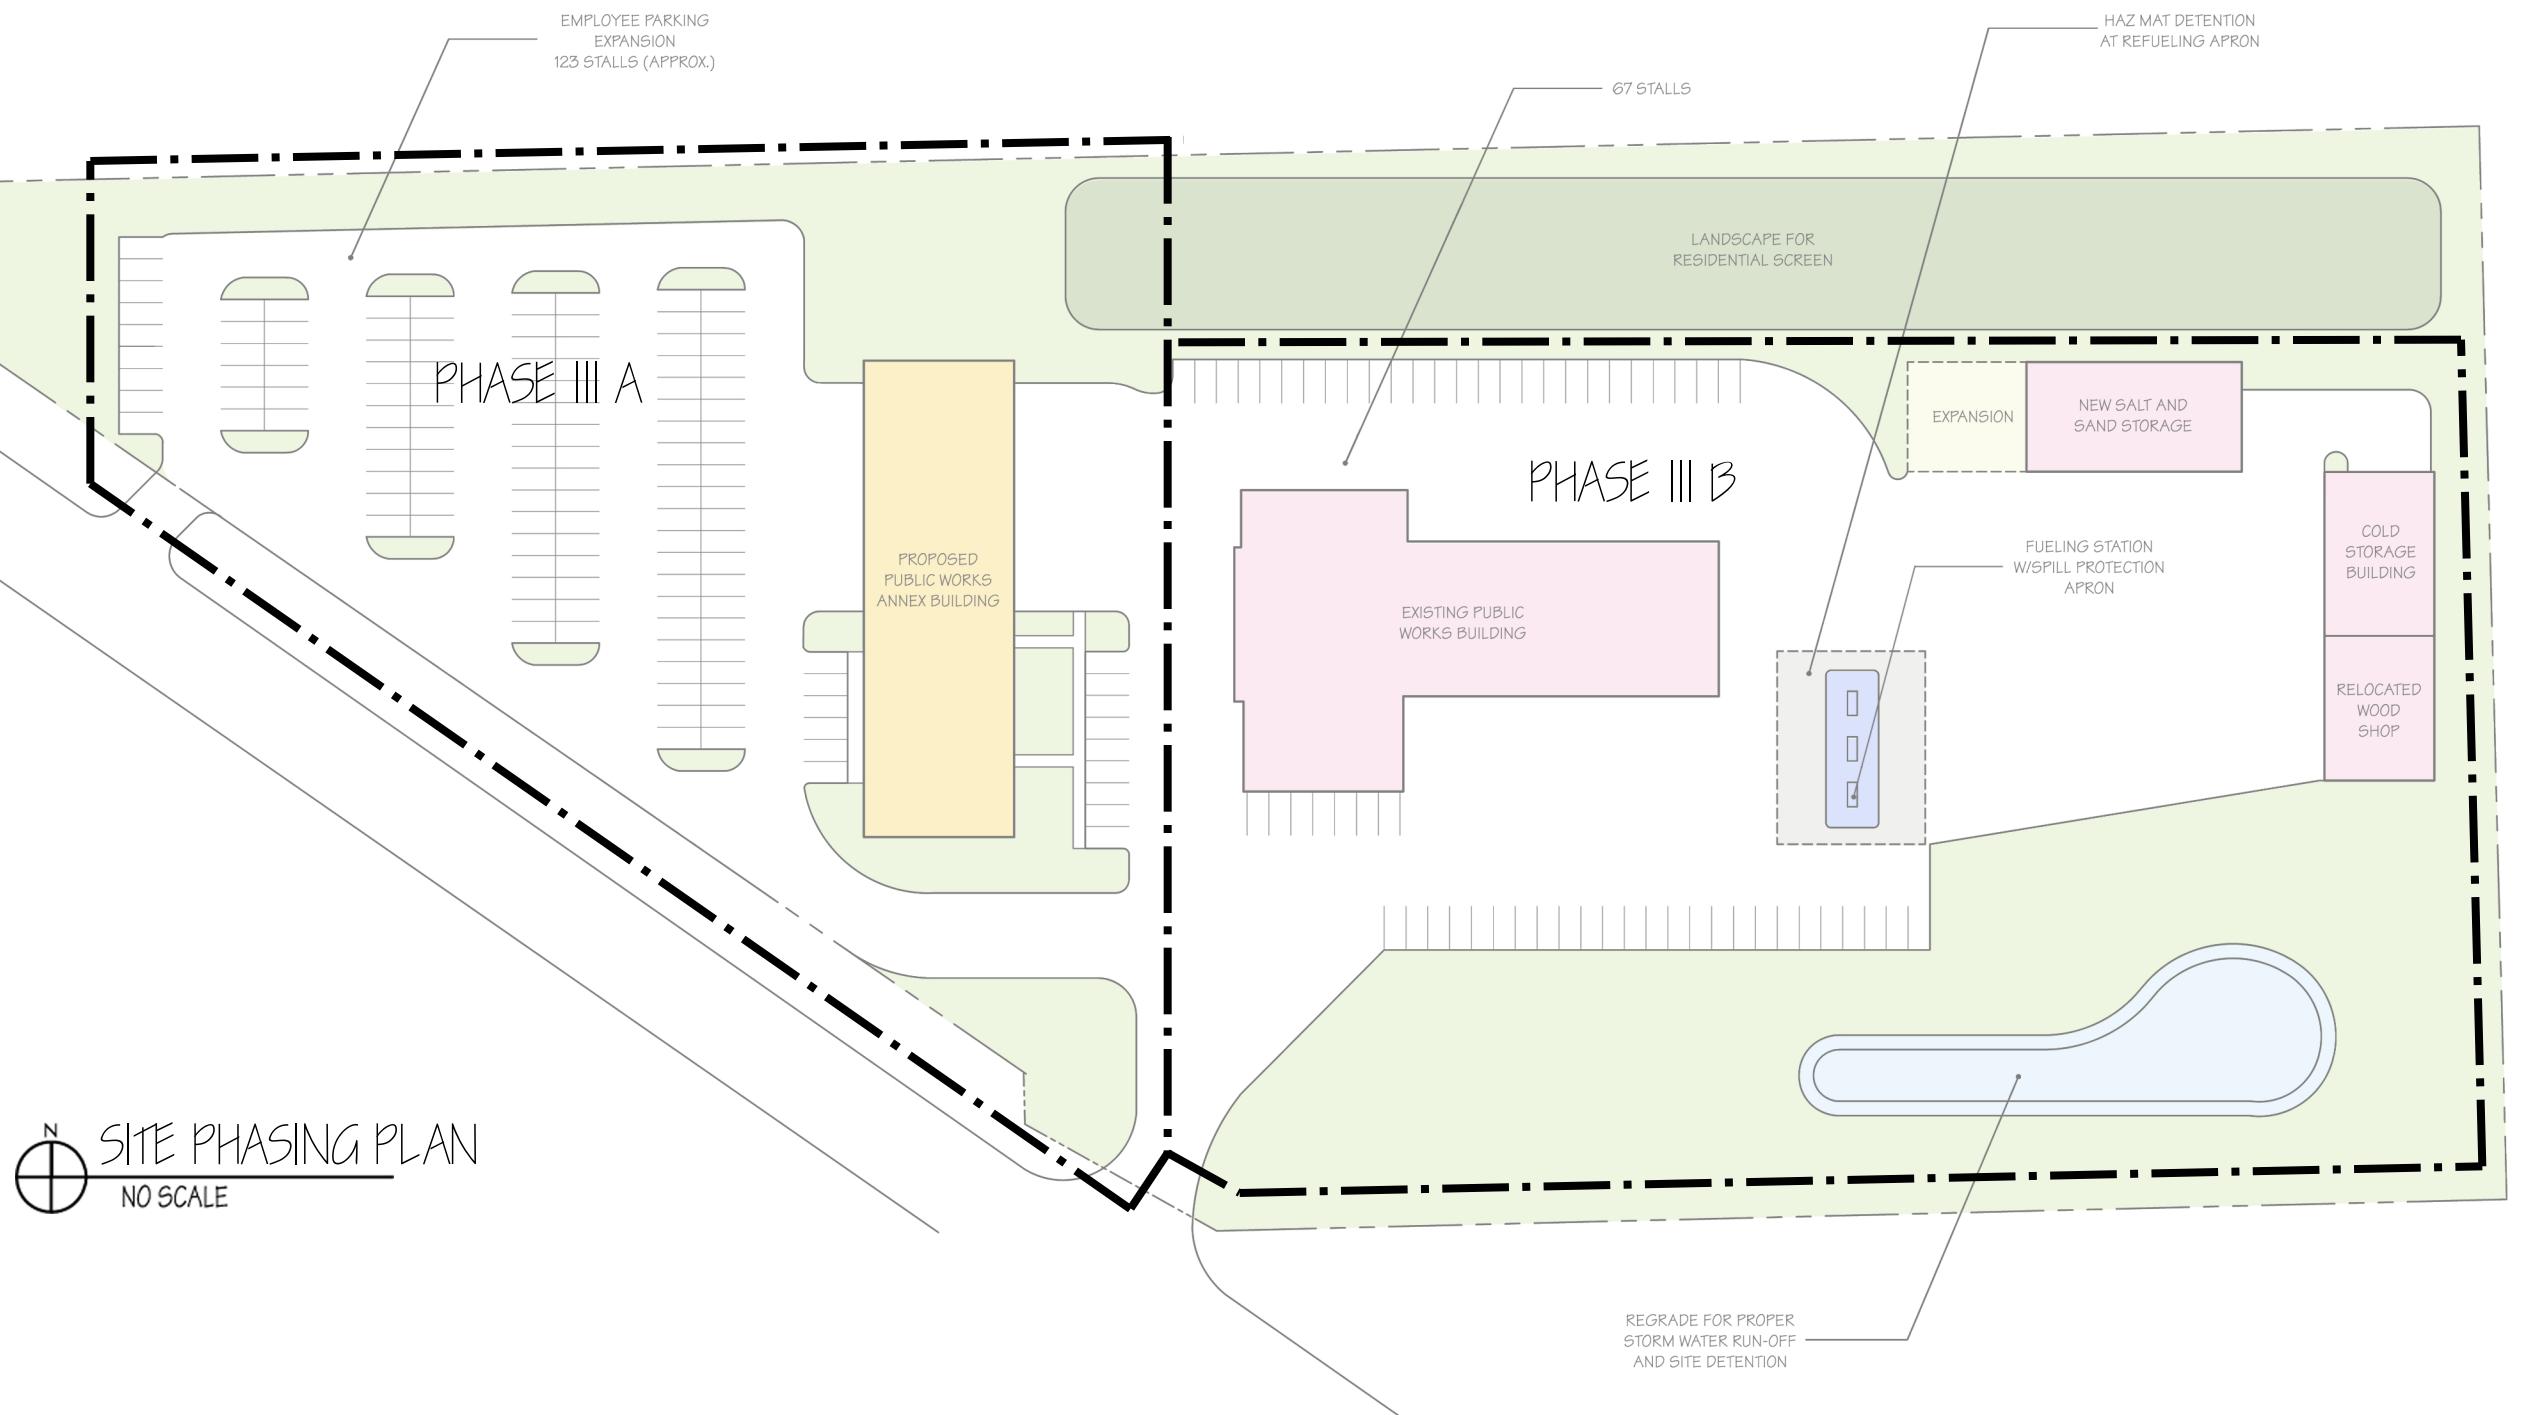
PUBLIC WORKS SITE PHASING PLAN
